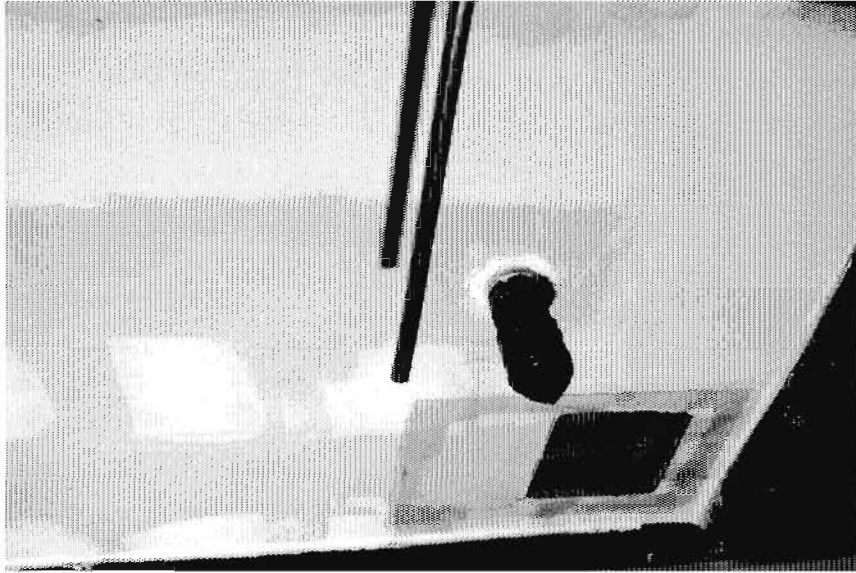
CAVITY VENT THROUGH BACKUP WALL
